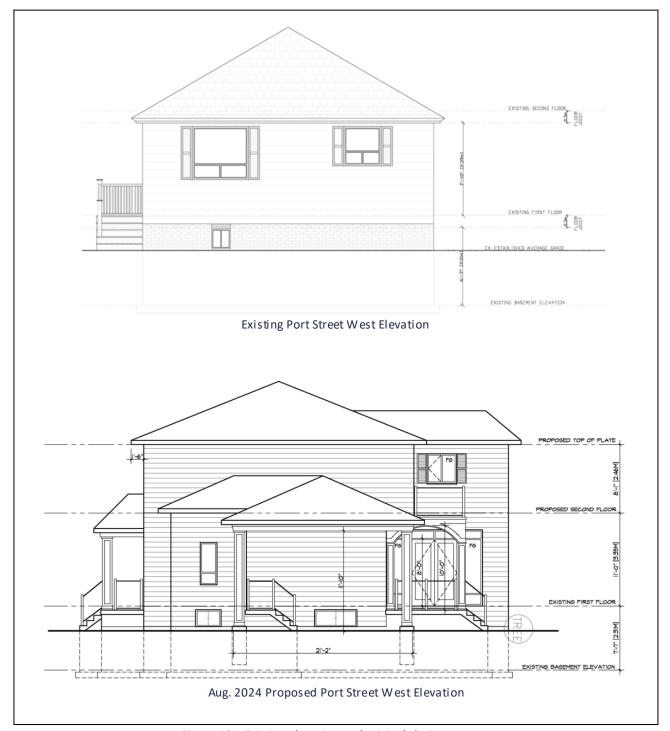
Existing elevation and original design concept (Blue Grove Engineering Group Inc., Aug. 2024)
